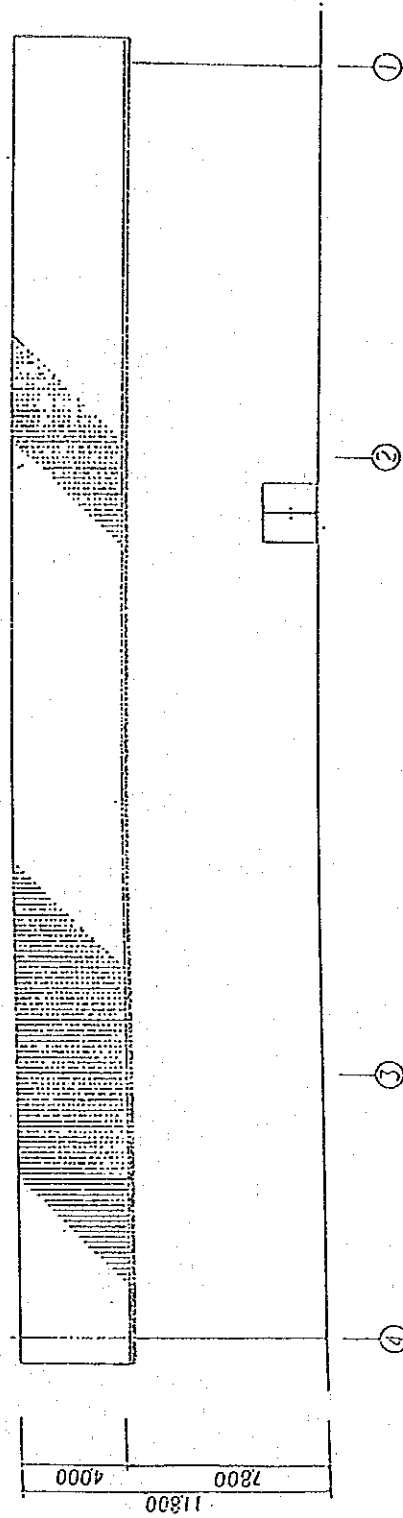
Elevation of Cold Storage, Ice Making Plant and Ice Storage
